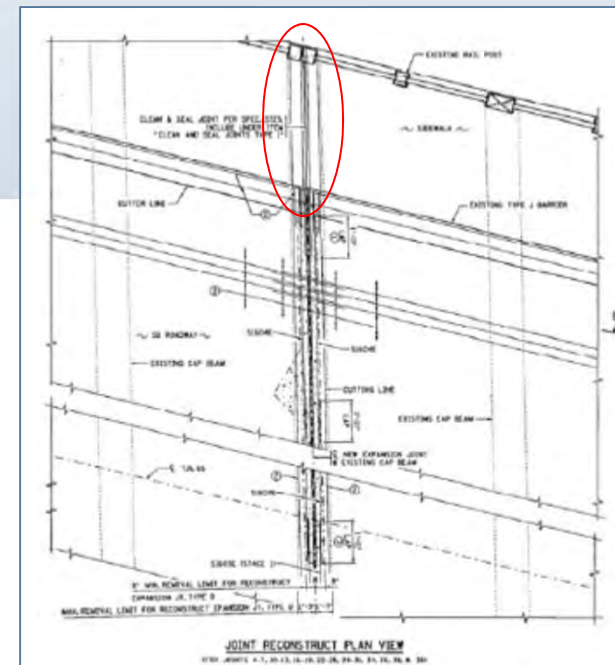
Half-deck plan showing strip seal in roadway only for joints located away from arch piers.
